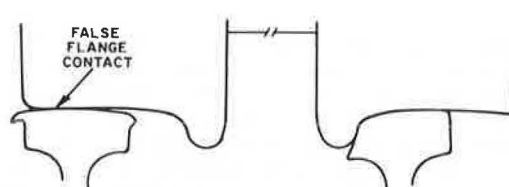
Wheel and rail contact geometry in curves with wide gauge.
